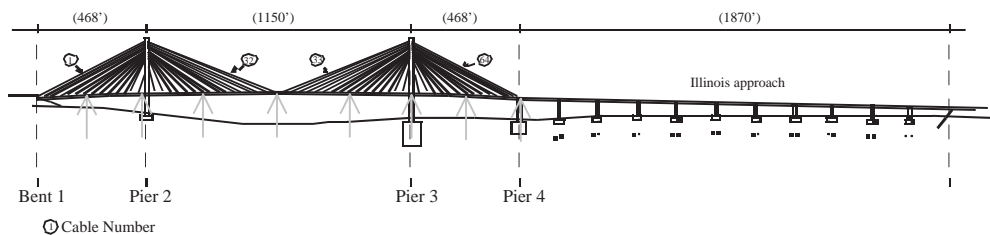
Sensor placement on Emerson Bridge (Arrows denote the sensors).
